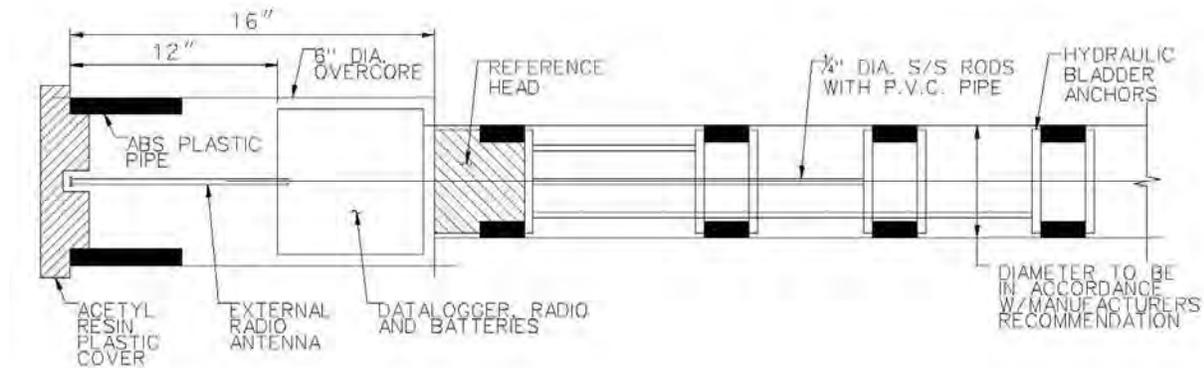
Horizontal Borehole Extensometer Installed from Advancing Excavation
